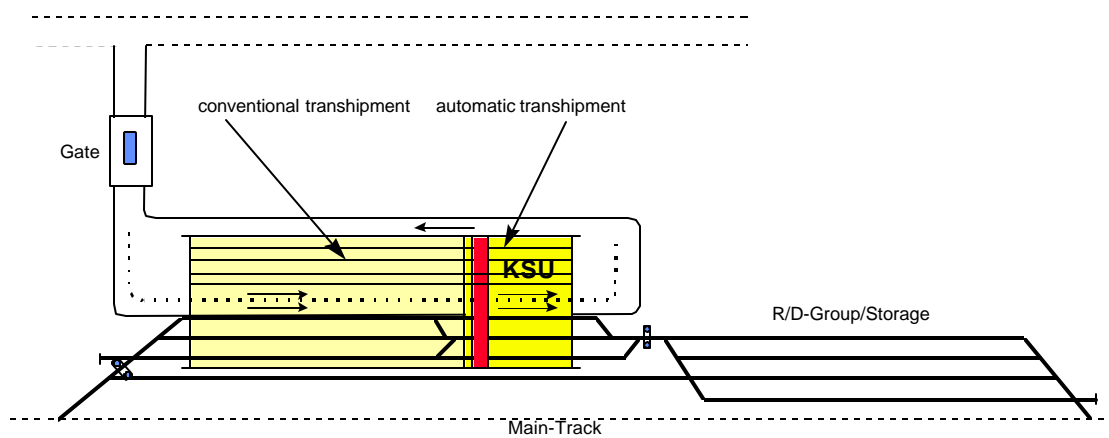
/2: Layout of Single Area Krupp Fast Handling System
